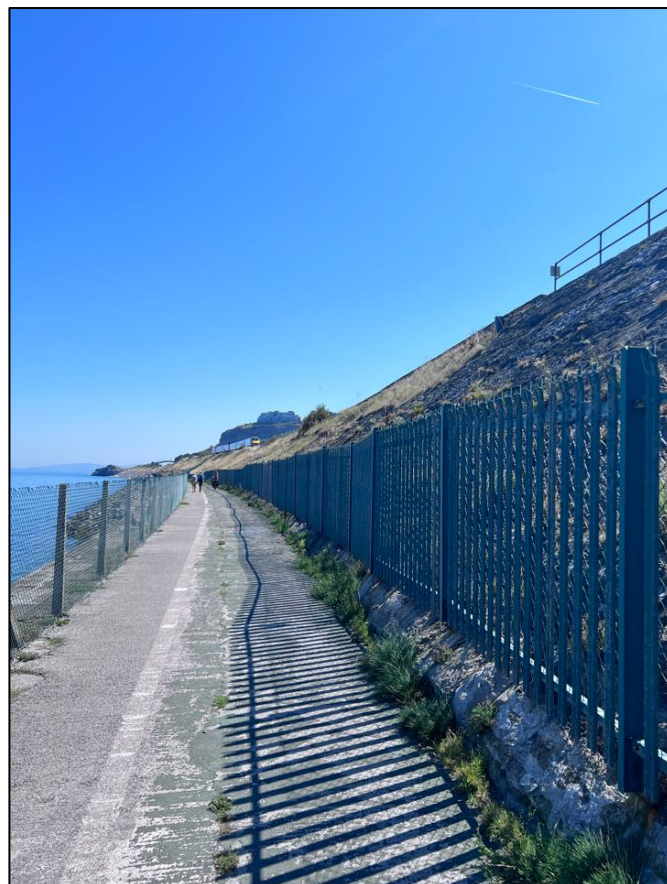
Public footpath below rail embankment close to footpath access point near Beach Rd.
